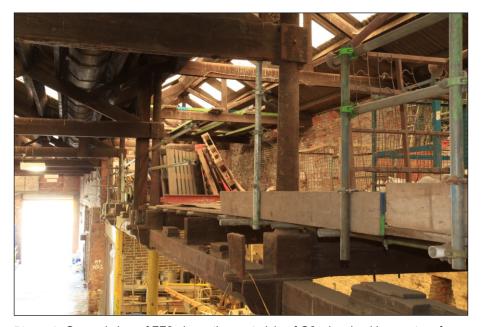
General view of FF6 above the east aisle of G6, showing king post roof trusses, looking north-east (Film 2.05)
